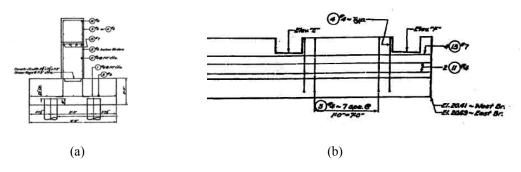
Bridge 5/649 Abutment Footing detail: (a) Cross-section, (b) Elevation
